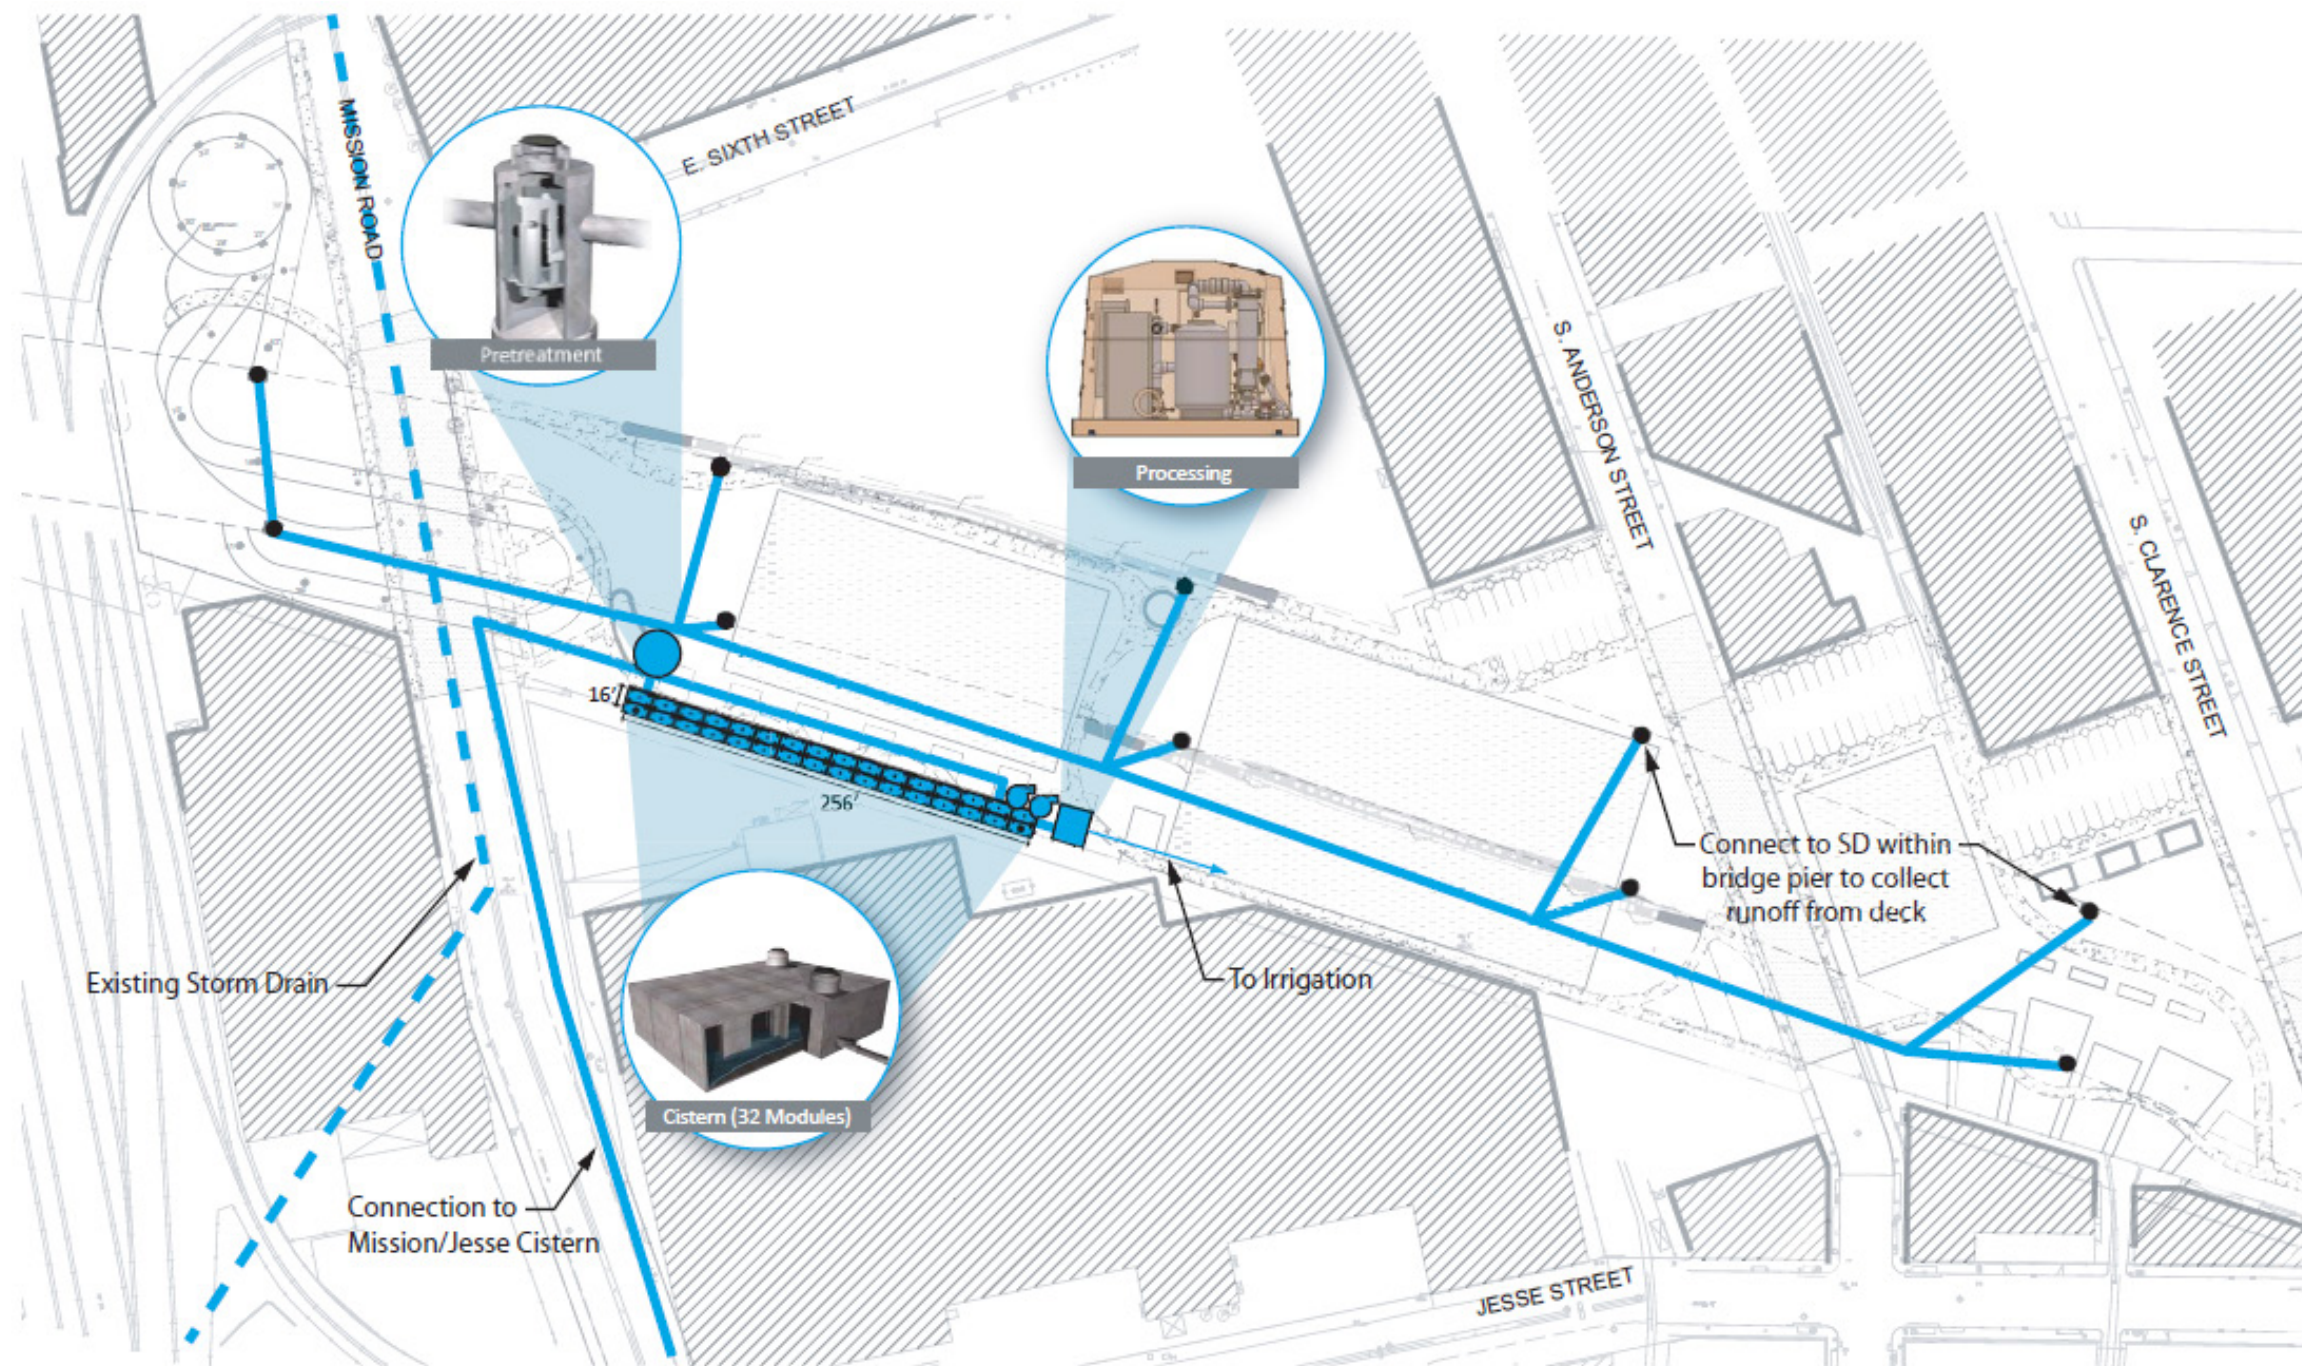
Stormwater Management System at 6th Street Viaduct Parklands
